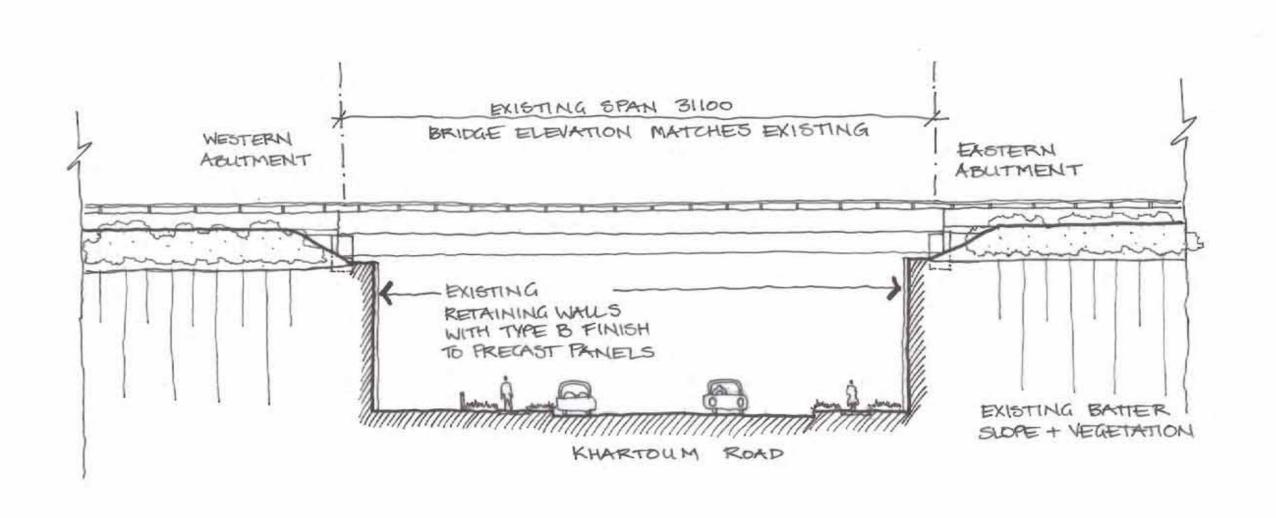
Bridge 6.1 Khartoum Road Bridge - Elevation
